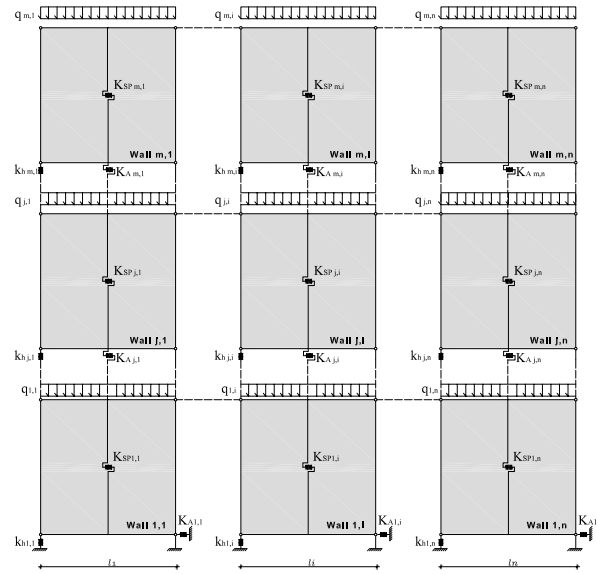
System of  $m \times n$  walls modelling a full-scale building
